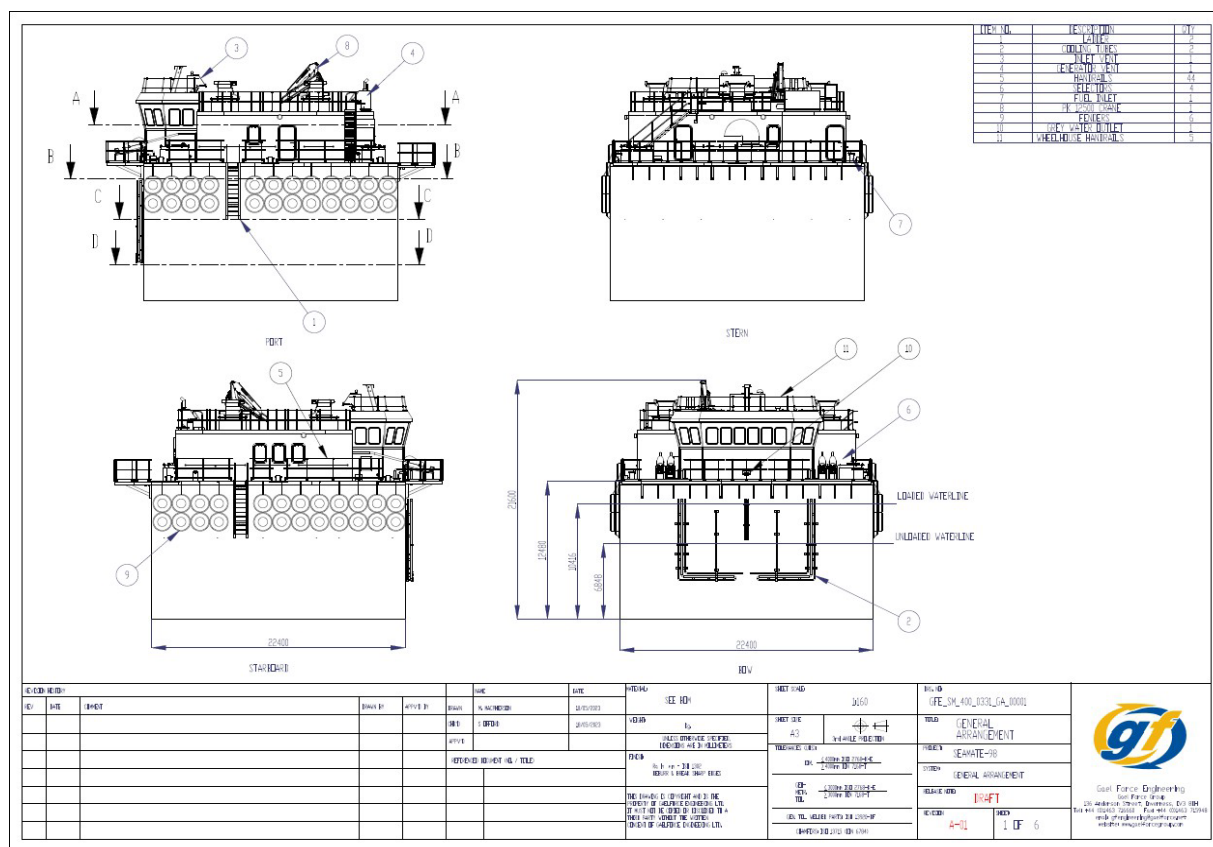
400T Seamate Barge Plans (original scaled drawings in Appendix 6).
